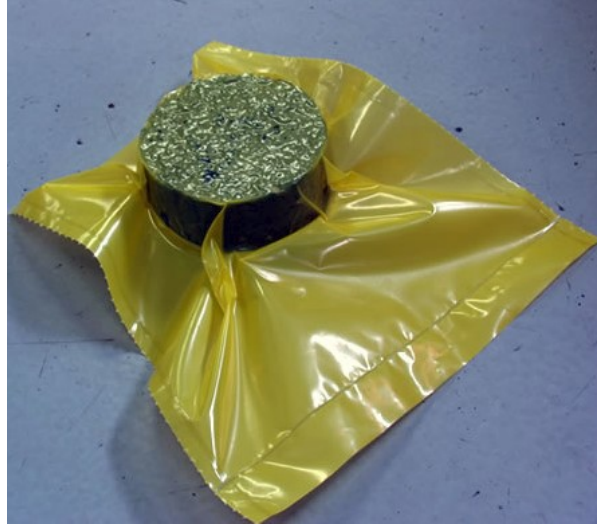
CoreLok sealed specimen (Source: [www.pavementinteractive.org](http://www.pavementinteractive.org))
